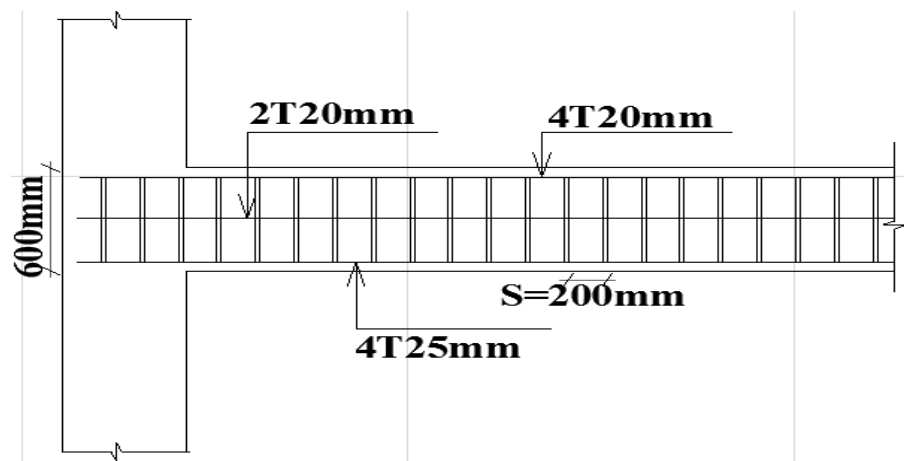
14: Longitudinal section of the steel reinforcement of the beam
